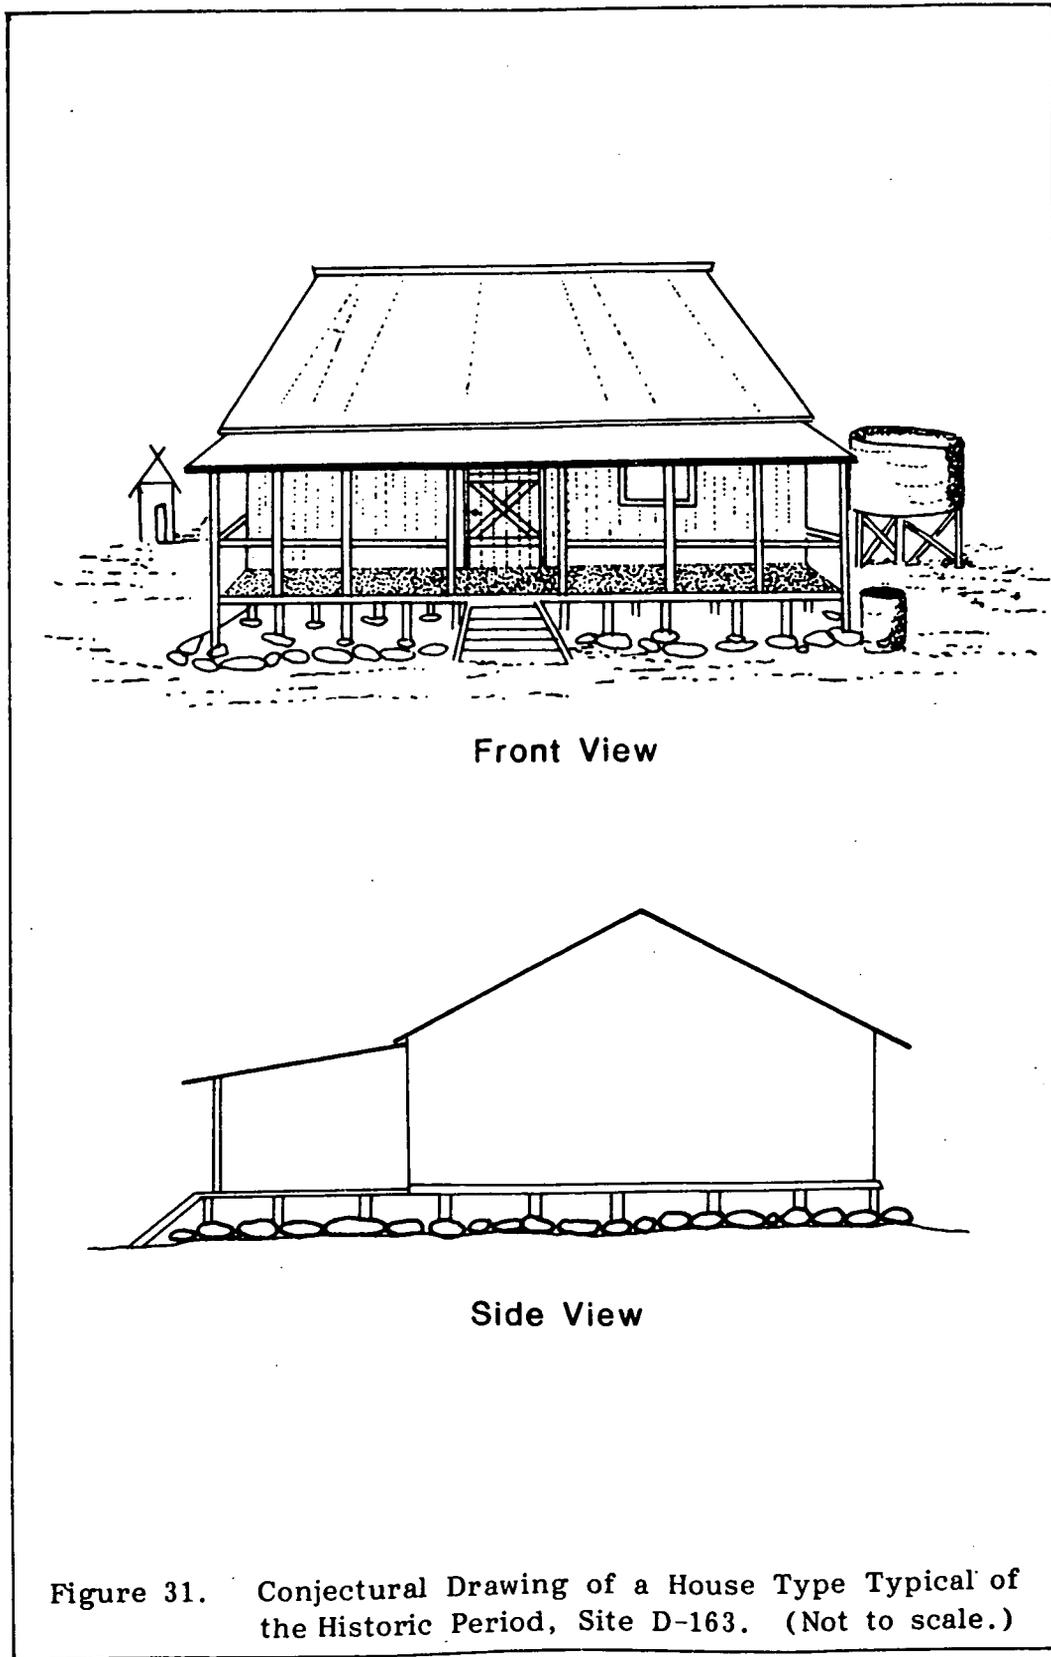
Conjectural drawing of typical historical-period house (Site D-163), Ki'ilae Village. Figure 31 in Ladd, *Ki'ilae Village*, p. 47.
